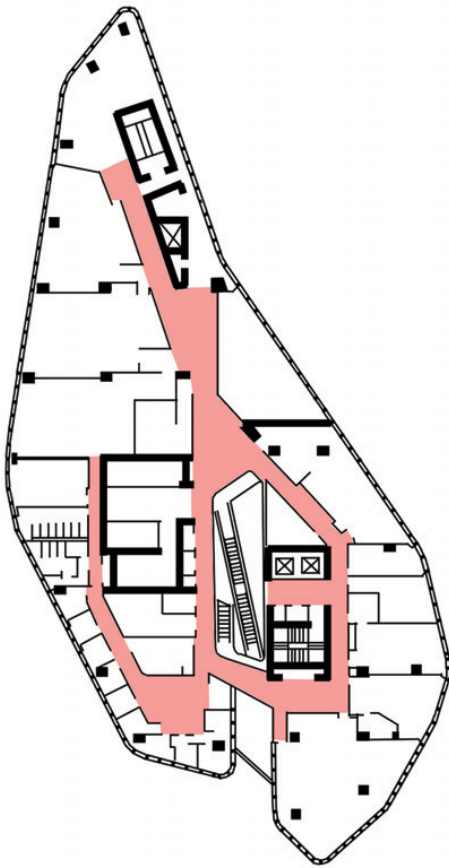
, 14 | Jockey Club Innovation Tower (2014) in Hong Kong, designed by Zaha Hadid: typical floor plan; view from the street (credits: floor plans redrawn and edited by J. Ochshorn, including highlighted circulation patterns; Jockey Club photo by J. Ochshorn, 2017).
